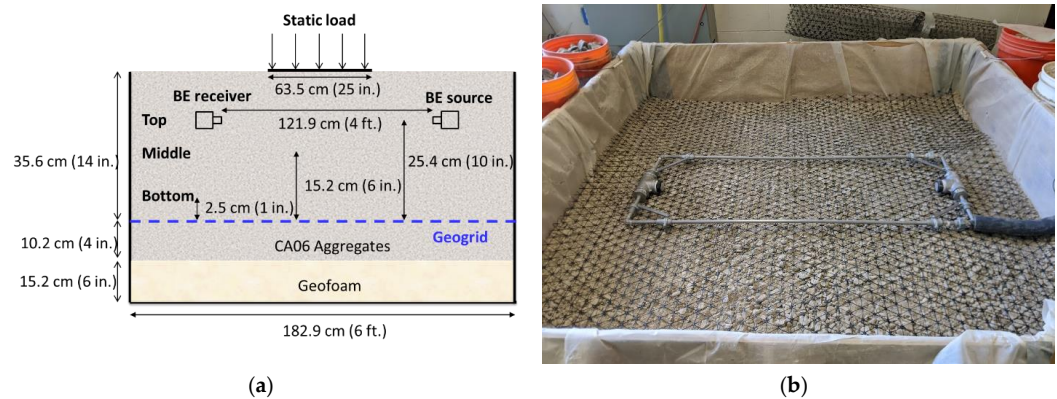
Large-scale testbed: (a) Schematic drawing of the test setup; (b) BE field sensor installed at the bottom location in the testbed.
